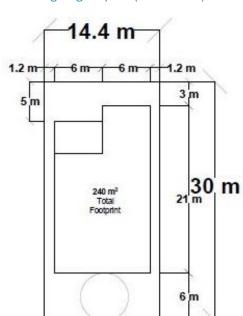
Detached house with double garage layout (400m<sup>2</sup> site) at 25 dwellings per hectare net.
